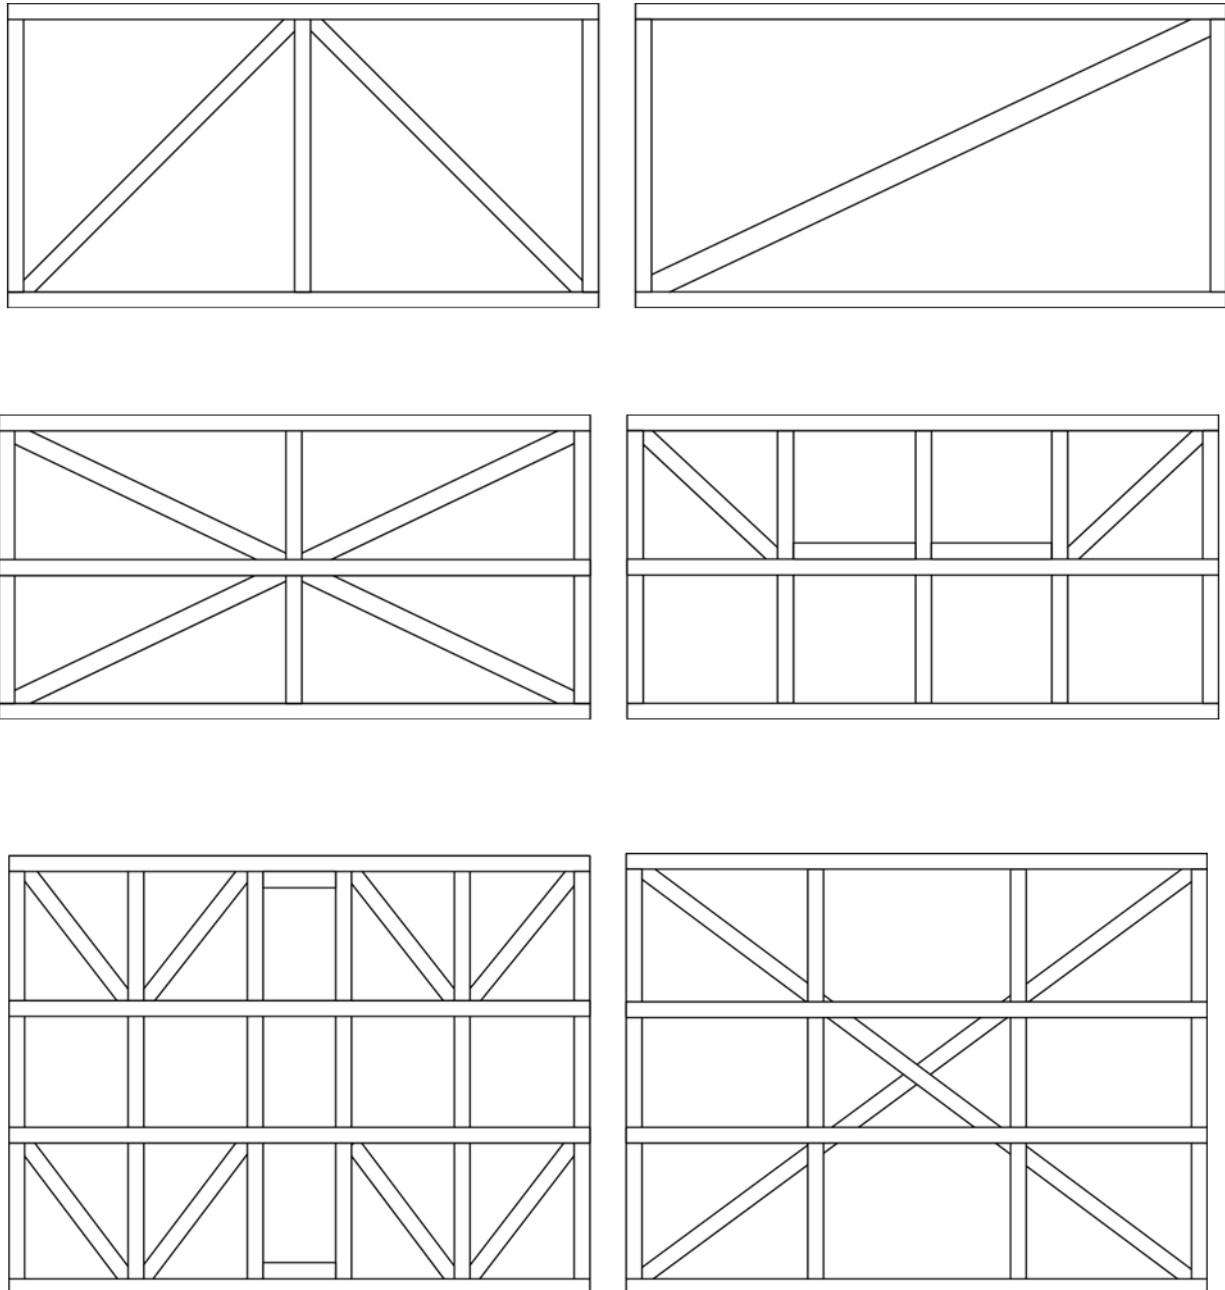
Panels with diagonal bracing for cases of design 2
